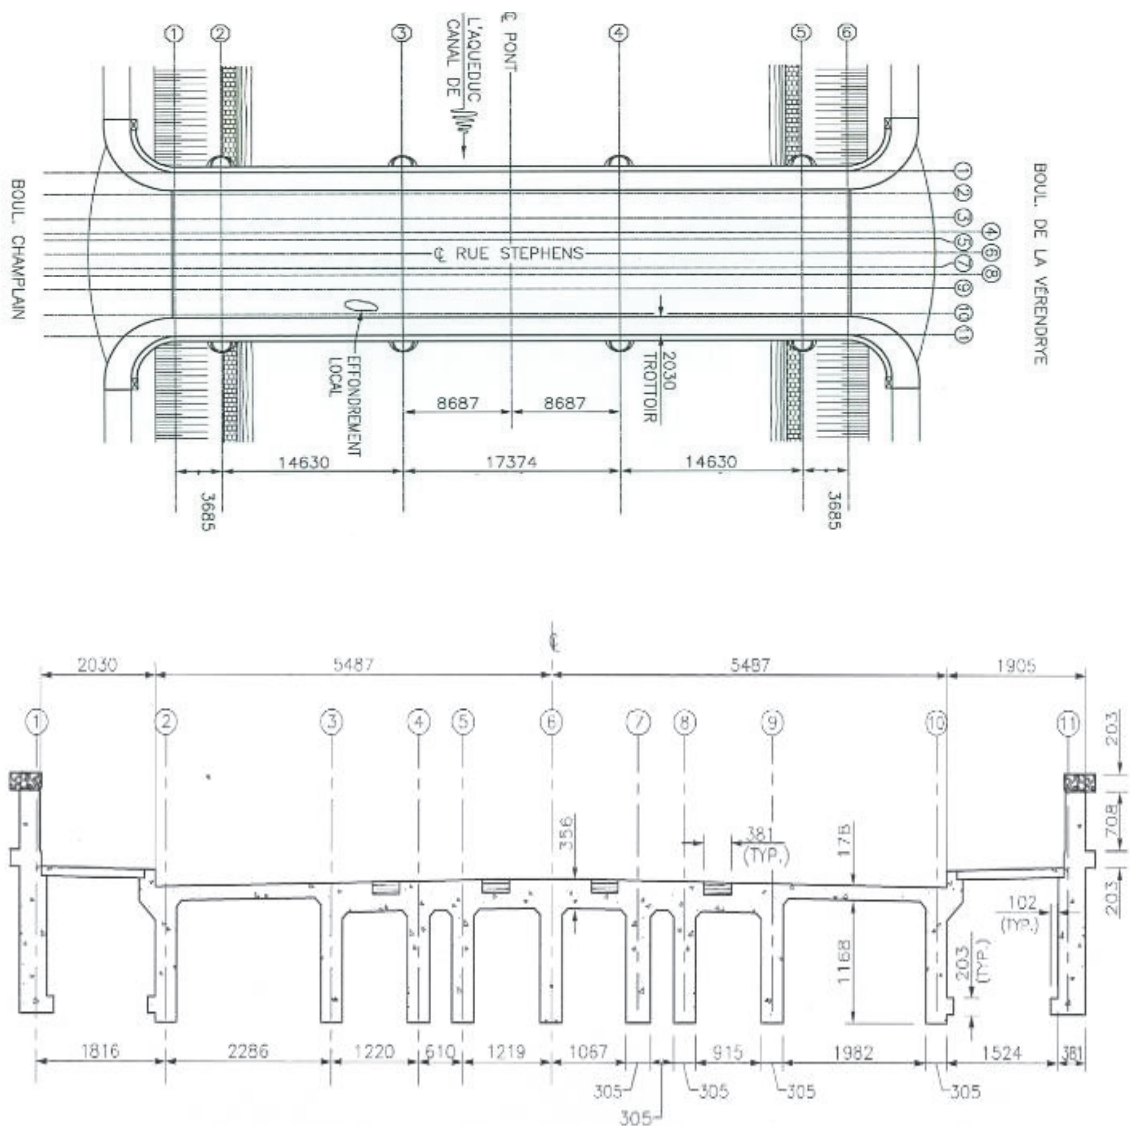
Plan View and Cross Section of the Monk Bridge, Montreal (Zaki 2000, with permission).
